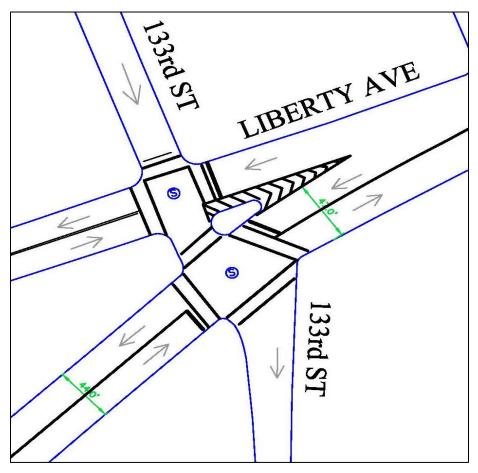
Liberty Avenue and 133rd Street Existing Conditions
